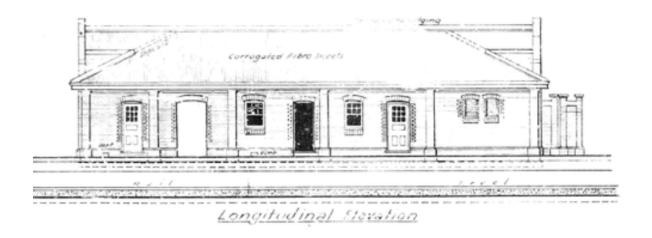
Extract from NSWGR plan of Tempe to East Hills Railway Station Buildings, showing longitudinal elevation of the Kingsgrove Station Signal Building with corrugated Fibro Sheet roofing, 1929.
